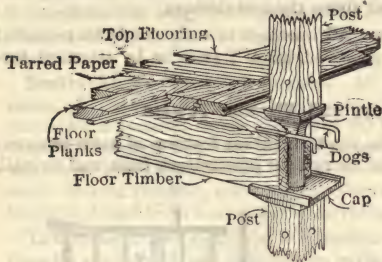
Post-cap and Pintle for Floor-timber and Columns
